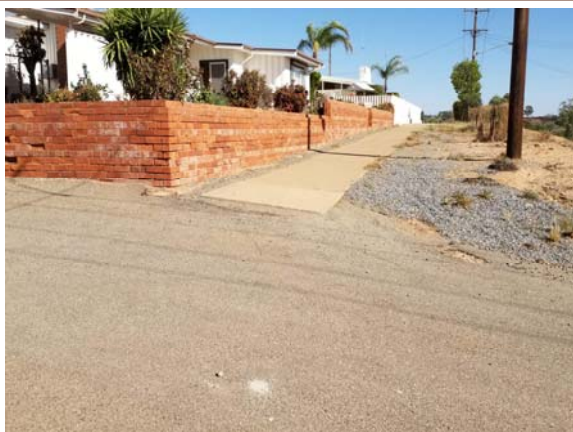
Wolfram Street - Non-compliant kerb ramp
